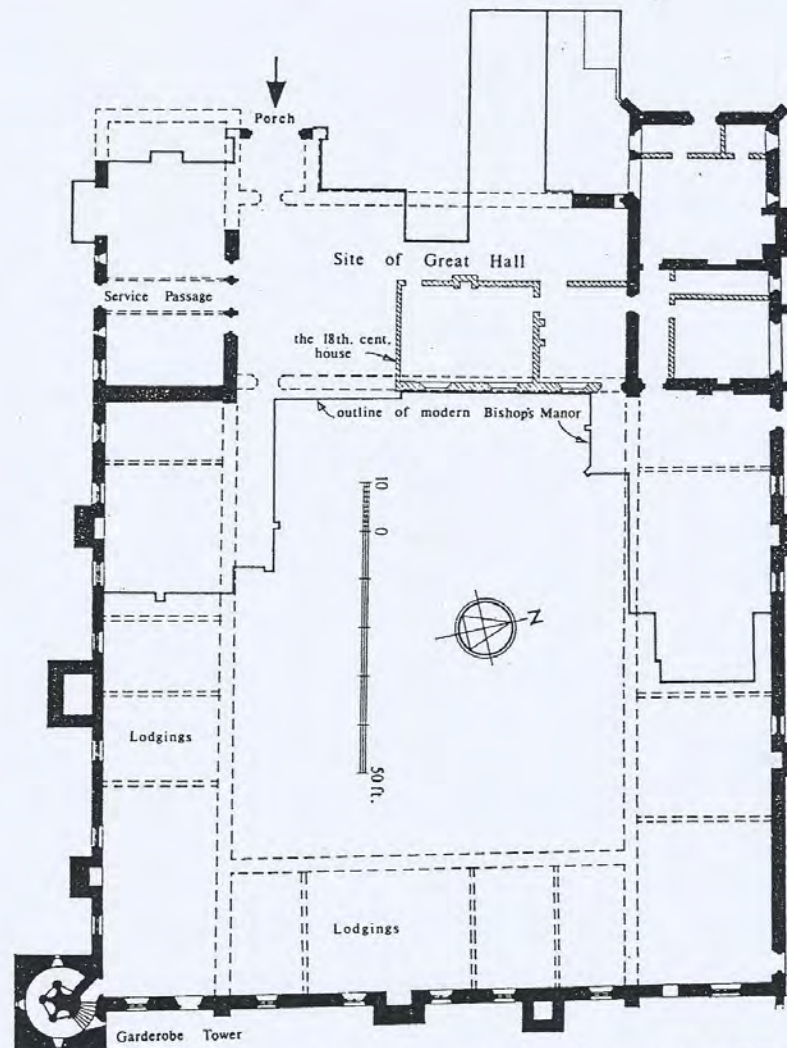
Ground floor plan of The Archbishop's Palace. The remaining masonry walls are shown in black, and a reconstruction of the plan in dotted lines. The modern Bishop's Manor is within the heavy black lines at the west side of the courtyard.
